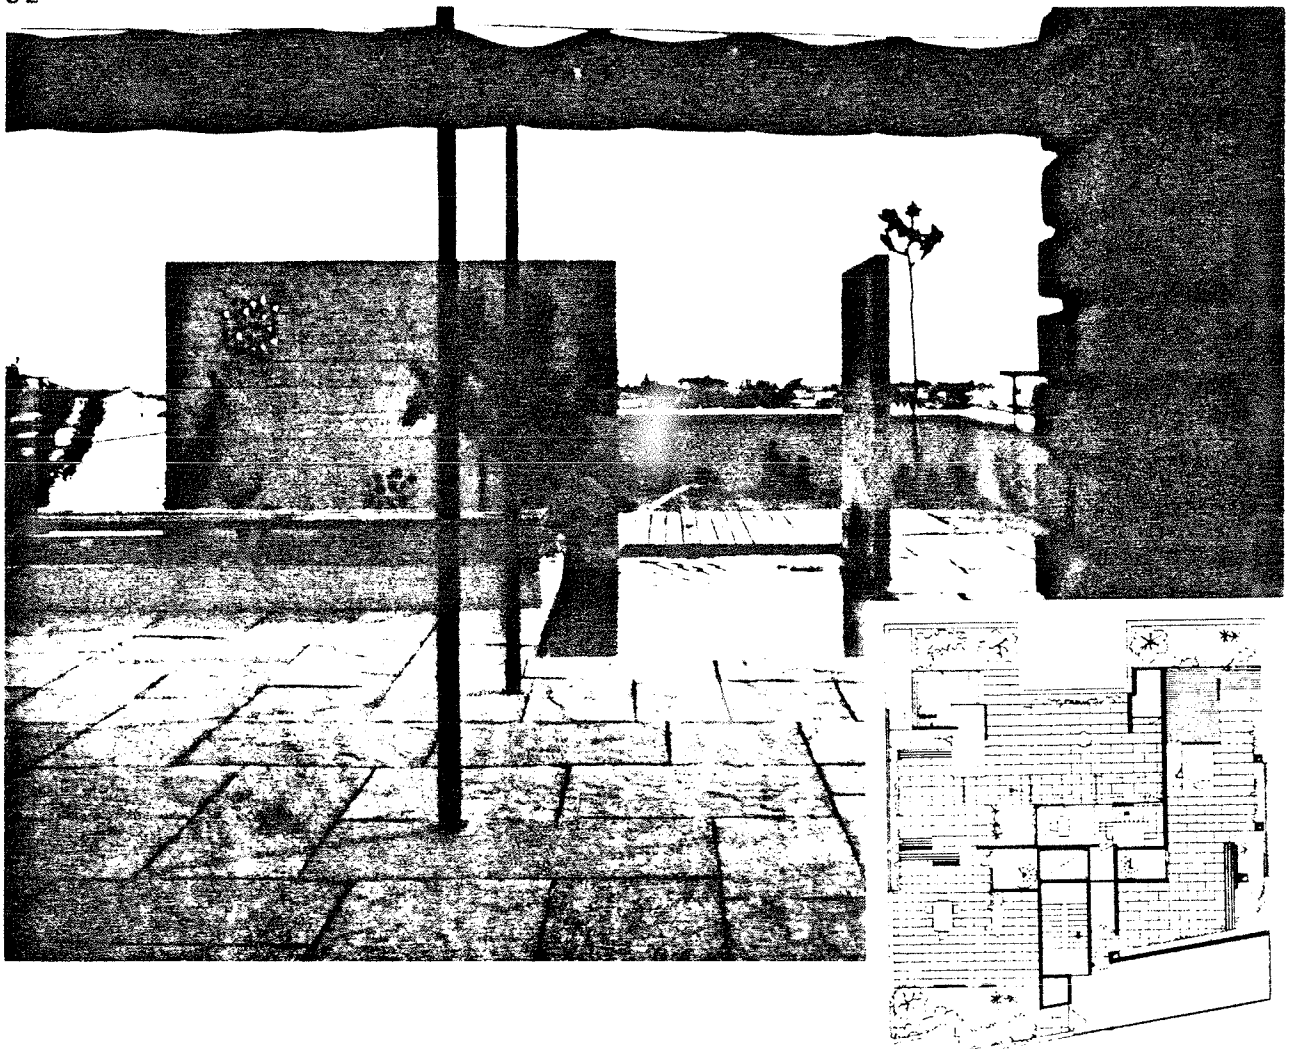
Apartment Block Roof Garden in Milan (From Gollwitzer and Wirsing, 1971.)
